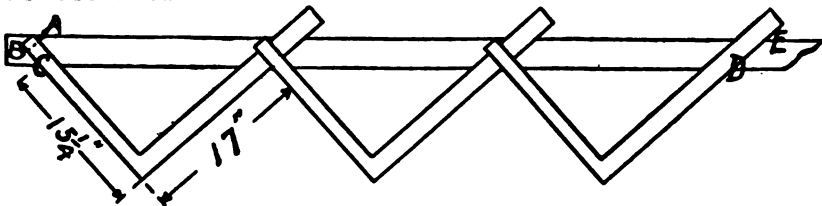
Method of laying out the rafter with the steel square in order to get the bevel at the ends of the rafter
